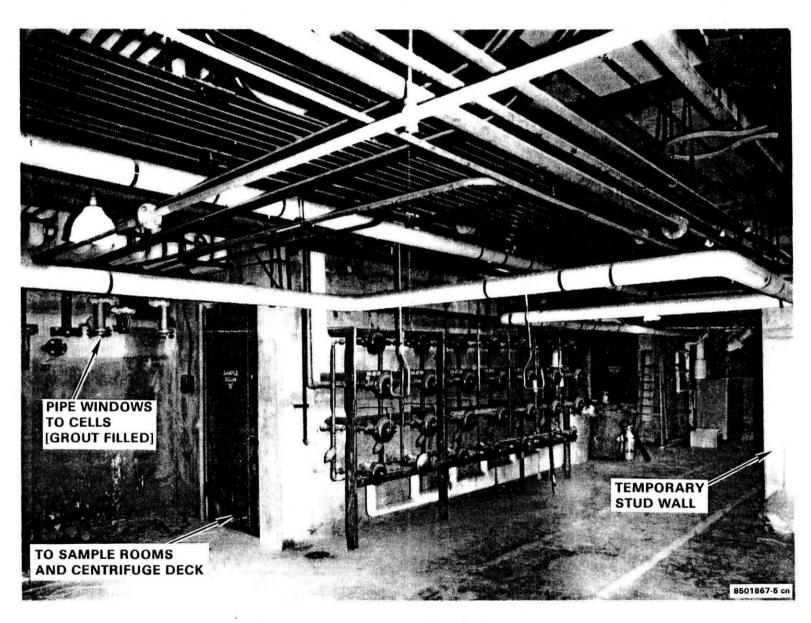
View of the 224-B Pipe Gallery (Second Floor).
